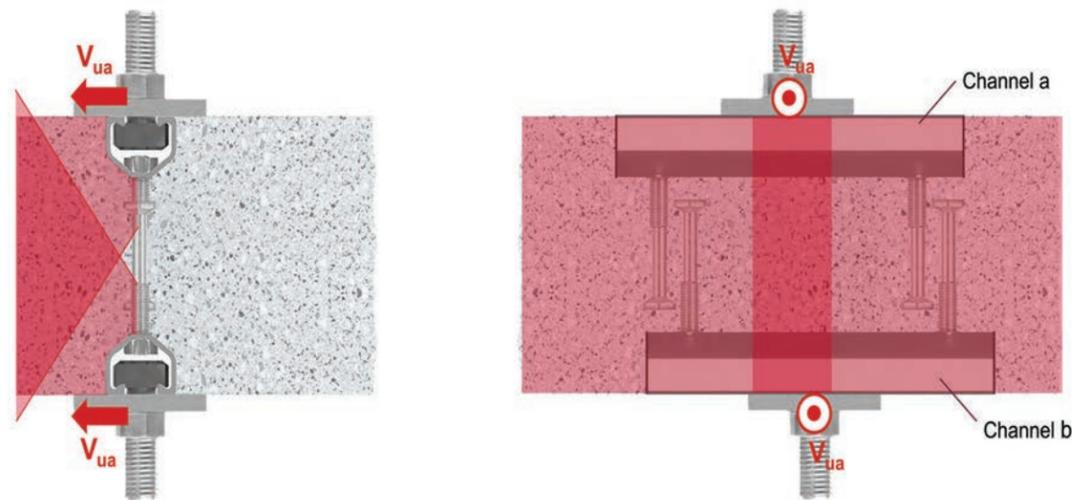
Intersecting Top and Bottom Channel; shear loading
